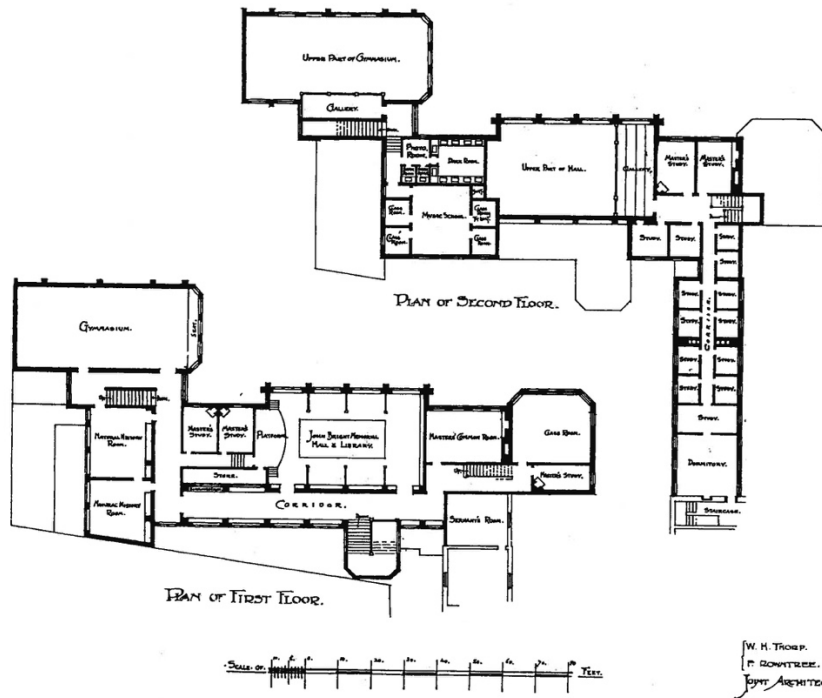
1899 Thorp and Rowntree proposal drawing first and second floors
